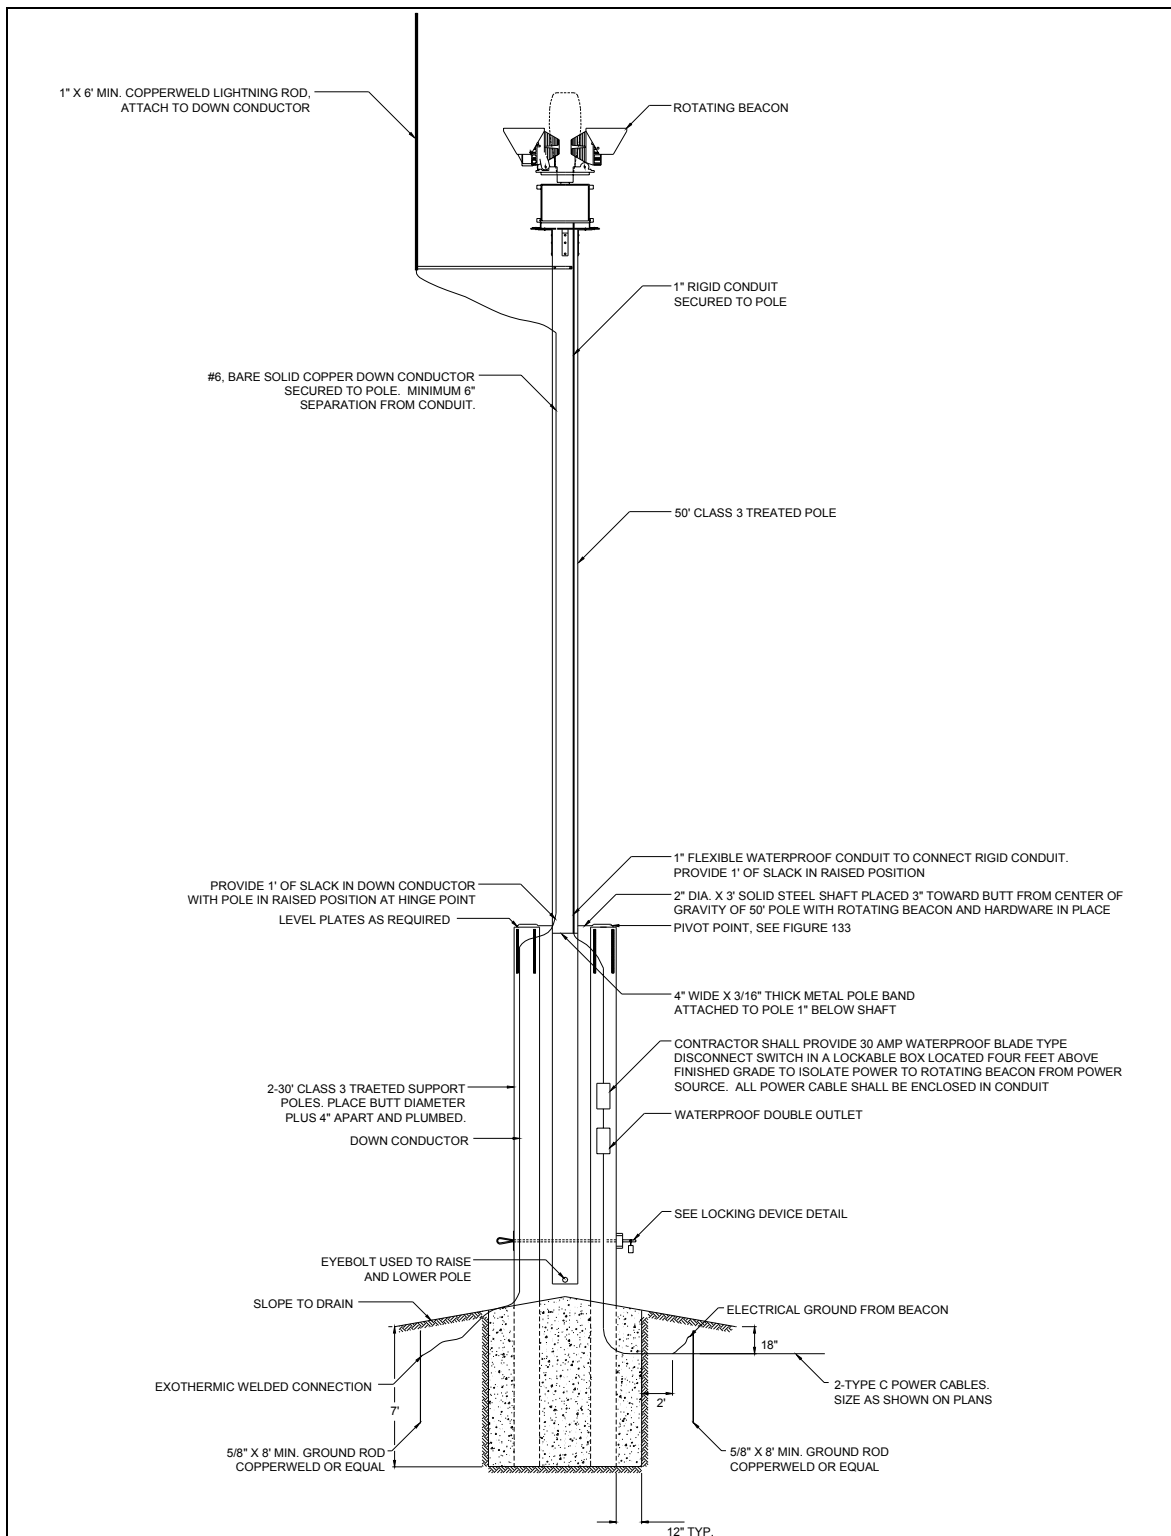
Standard Details for Pivoting Rotating Beacon Pole – GL-600 Sheet 4D
